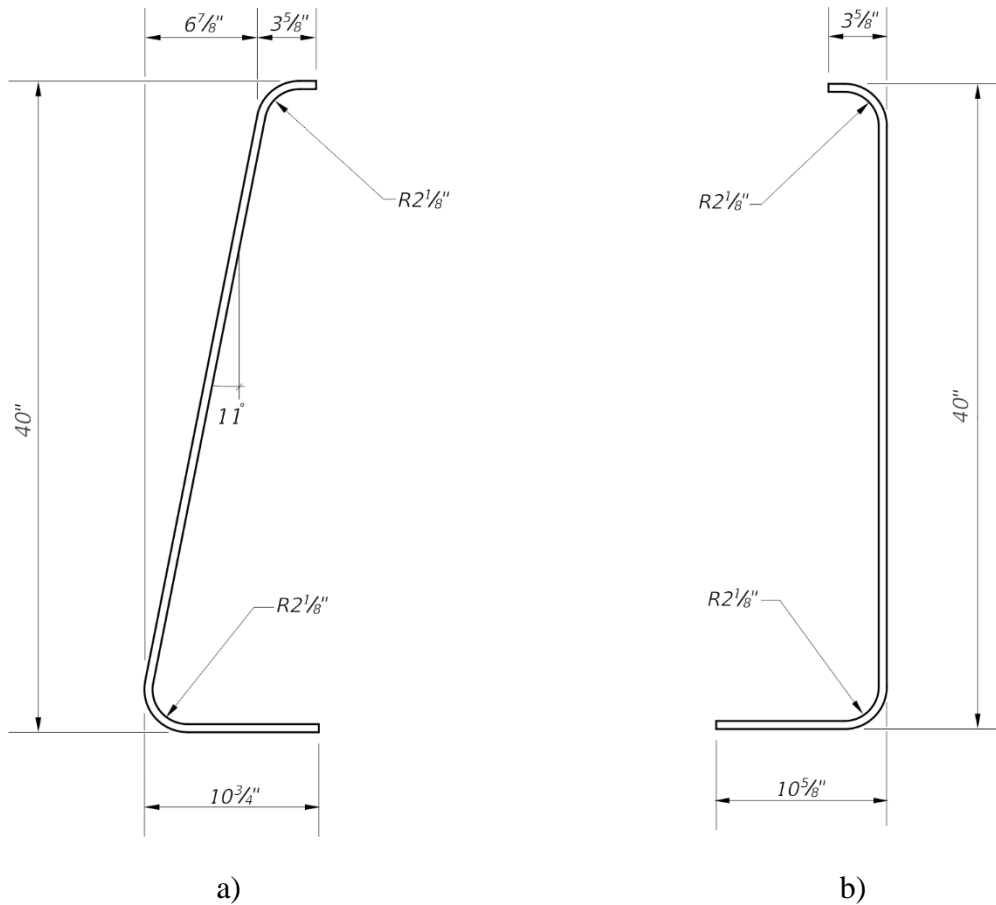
Stirrups of GFRP-reinforced bridge rail:
